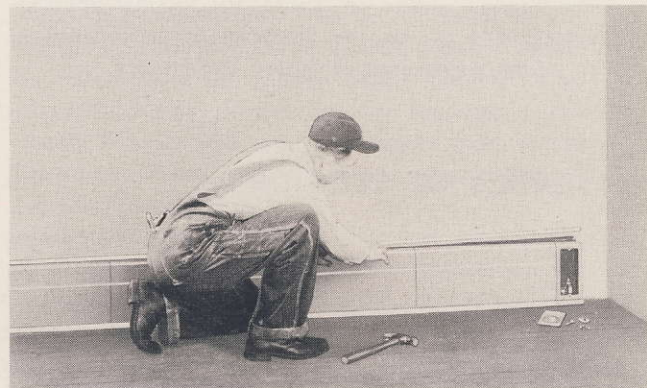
A strip of quarter round molding fastened on top of baseboard covers the seal.
